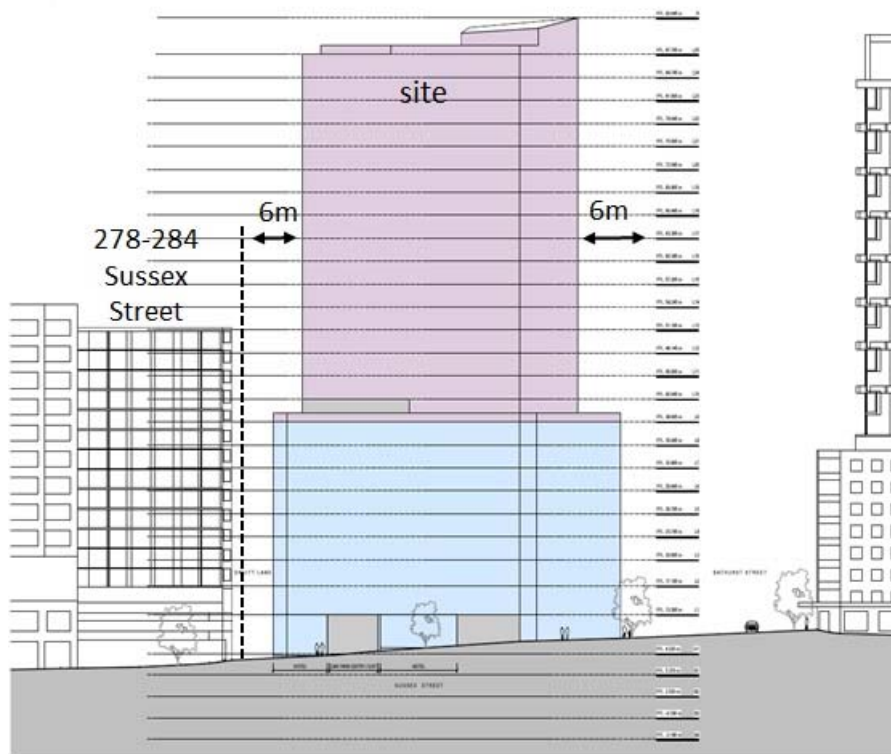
Western (Sussex Street) elevation of Stage 1 concept approval showing 6m approved setback above street wall height to Bathurst Street and 6m setback from the centreline of Druitt Lane.
